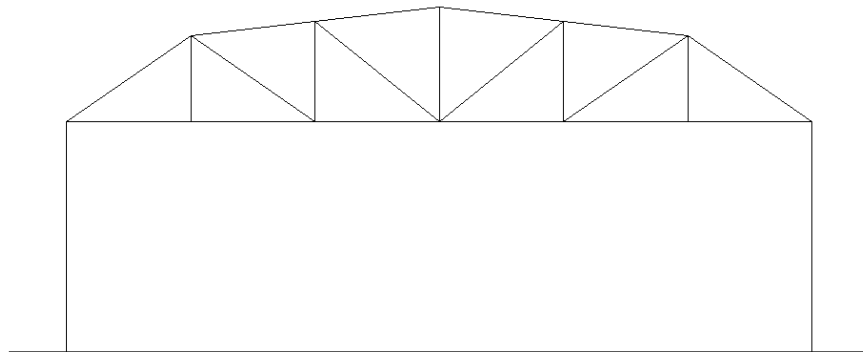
Wood Truss Configuration with Top Chord Separated Into 6 Members
